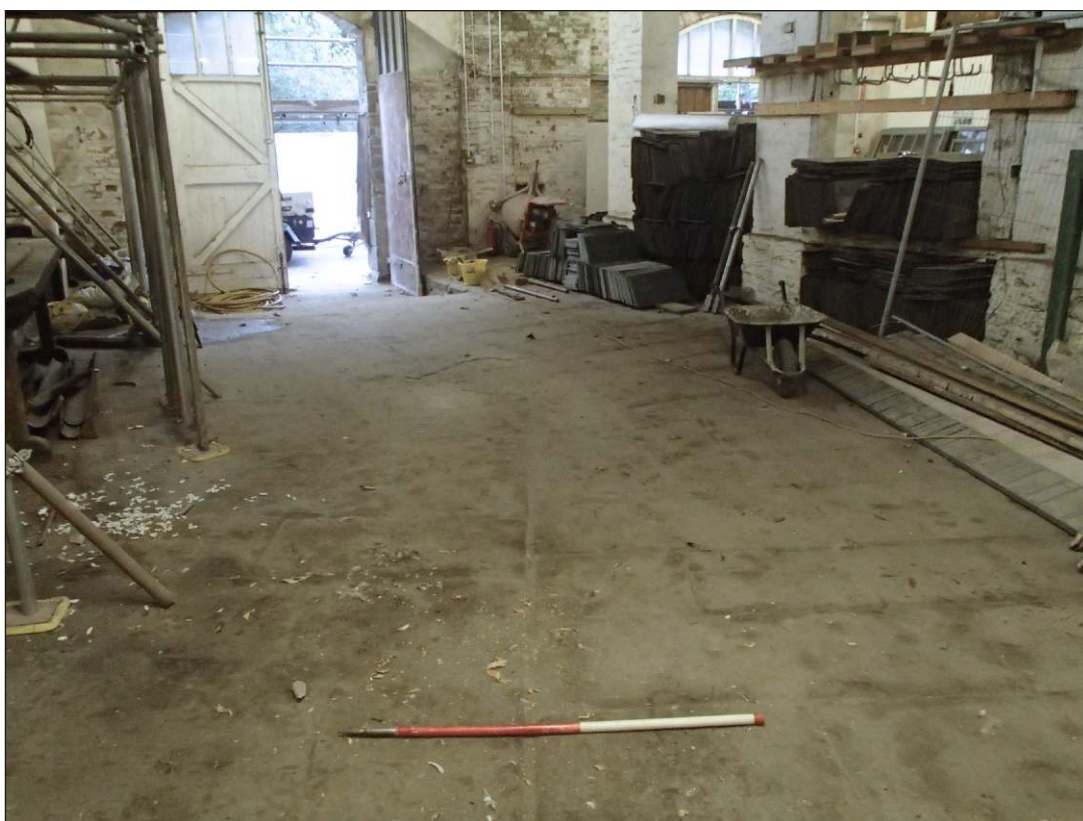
The north range showing the drain in the floor, looking southeast. (1m scale)
